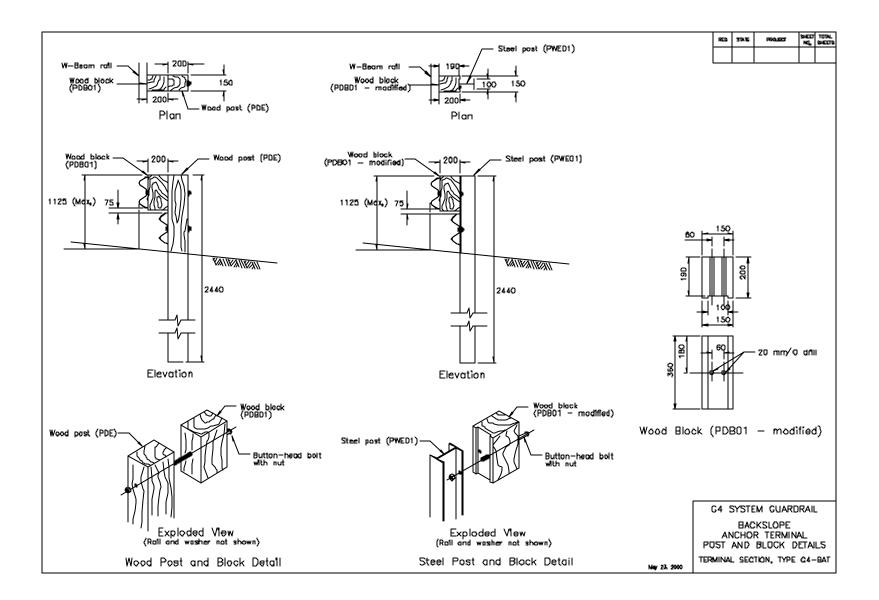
Details of the G4 W-beam guardrail buried-in-backslope installation for test 404211-13 (continued).
